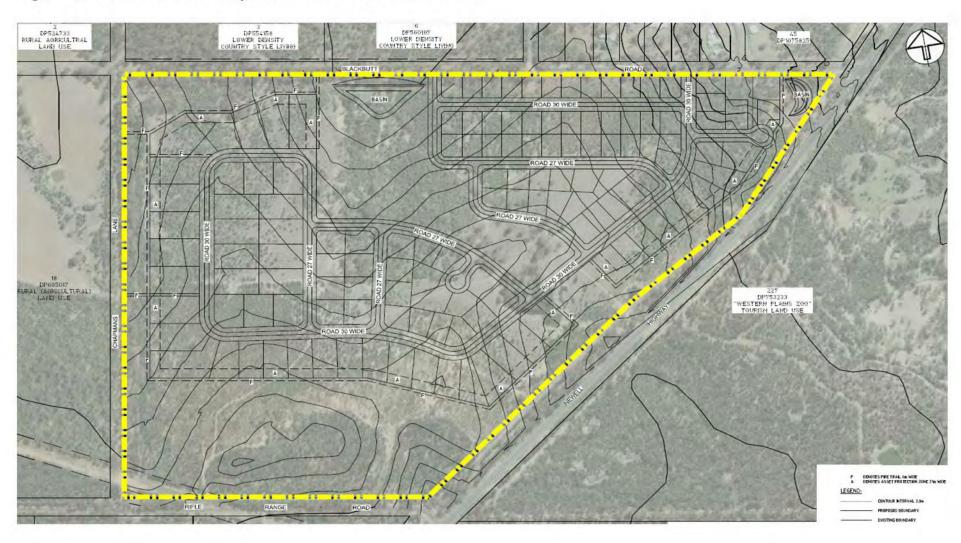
Subdivision Concept Plan - Blackbutt Road Dubbo.
